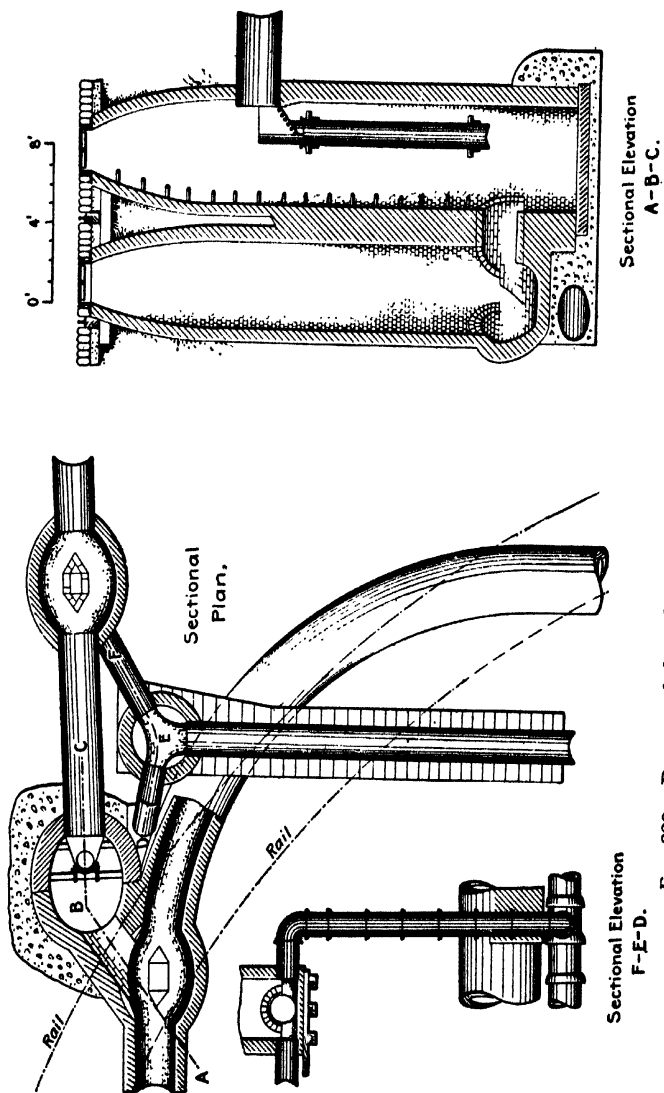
Drop manhole and underdrain overflow, Newton, Mass.
